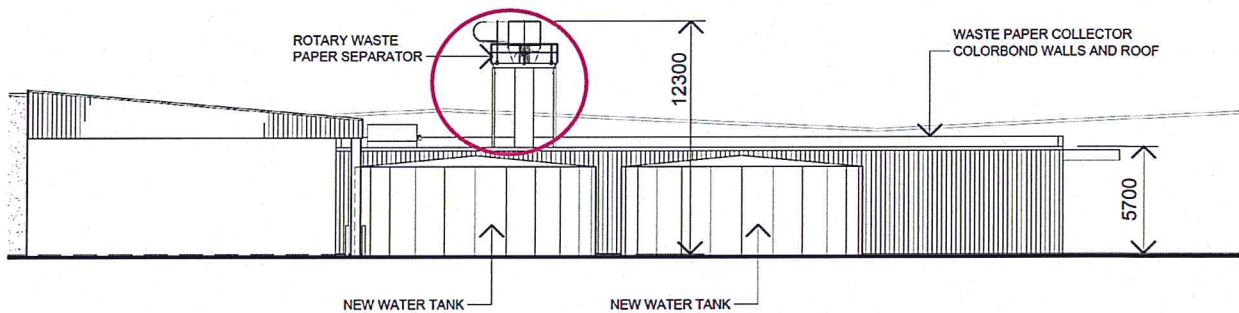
Part south building elevation showing protruding waste rotary paper separator
